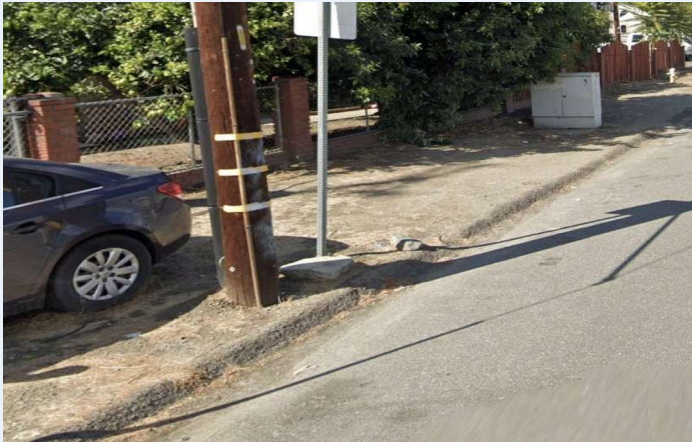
School-day No Parking restriction is posted, but no dedicated buffered walking facility is provided.
